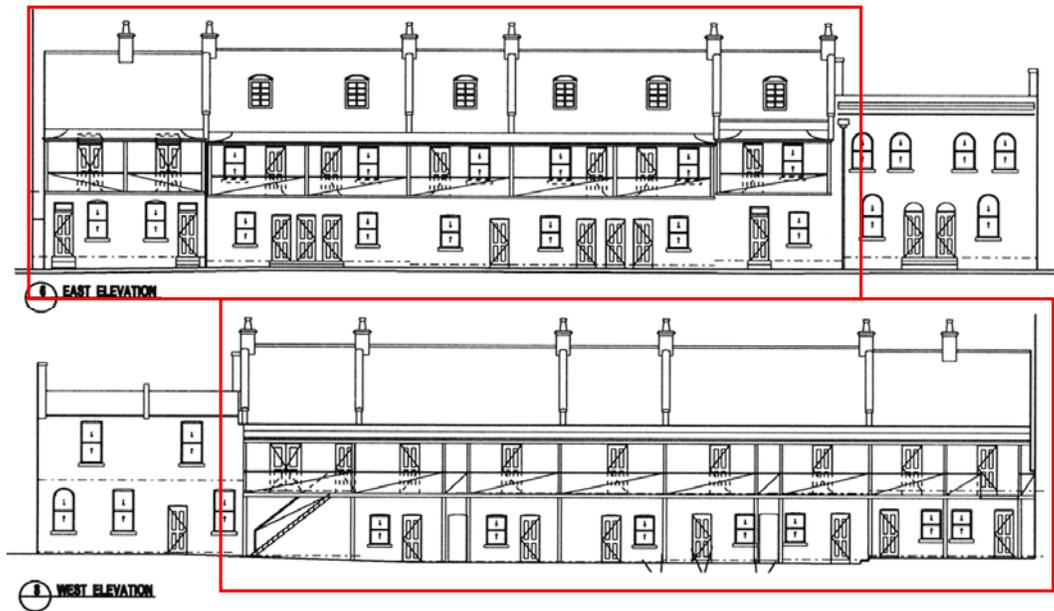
The Playfair (east) and rear (west) elevations of the building in the context of the adjoining terraces, Nos. 13-15 Playfair Street, to the north. (Source: The Foreshore Authority)
